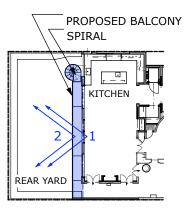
PHOTO LEGEND: PARTIAL PLAN @ 2ND FLOOR
